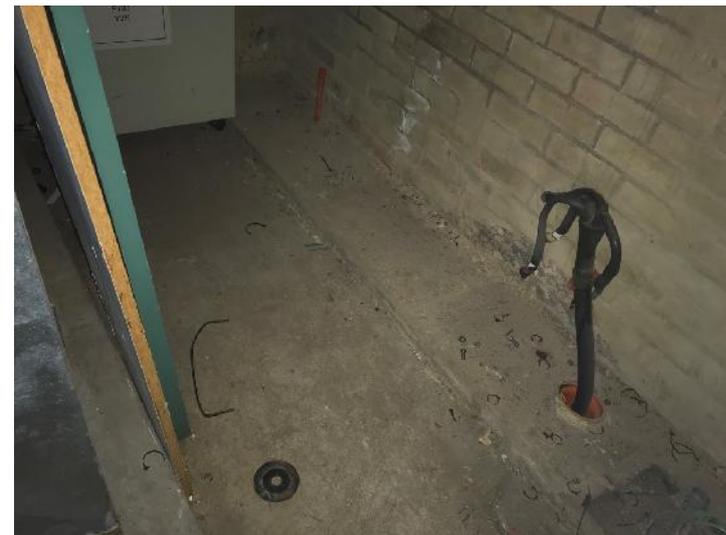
Electrical switchboard removed. Bathroom AC compressed sheeting removed. No visible AC debris remains
